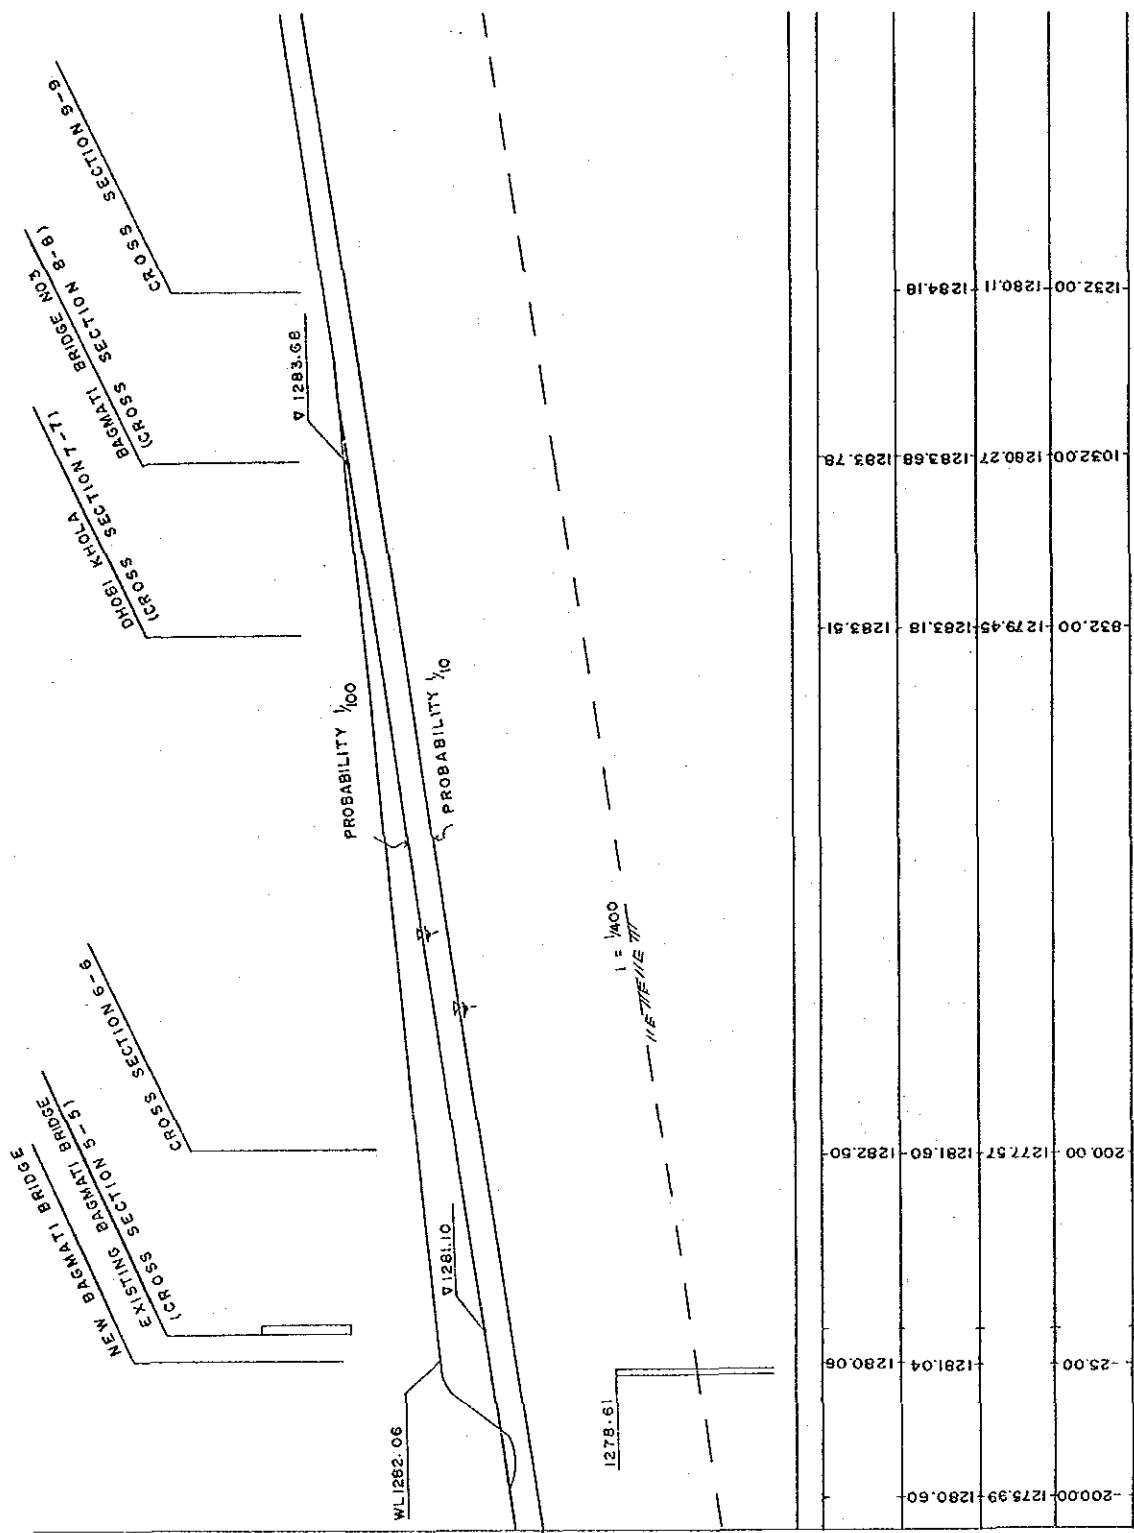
(1/2) BACK WATER BY GROUND SILL AT DOWNSTREAM OF BAGMATI BRIDGE NO. 2
